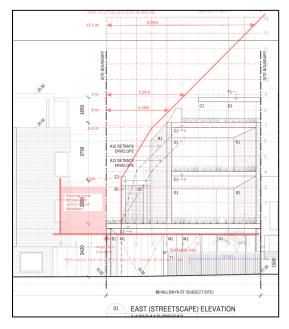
east elevation with A13 setback line shown from the FFL of the abutting second floor window of 91 Millswyn St
